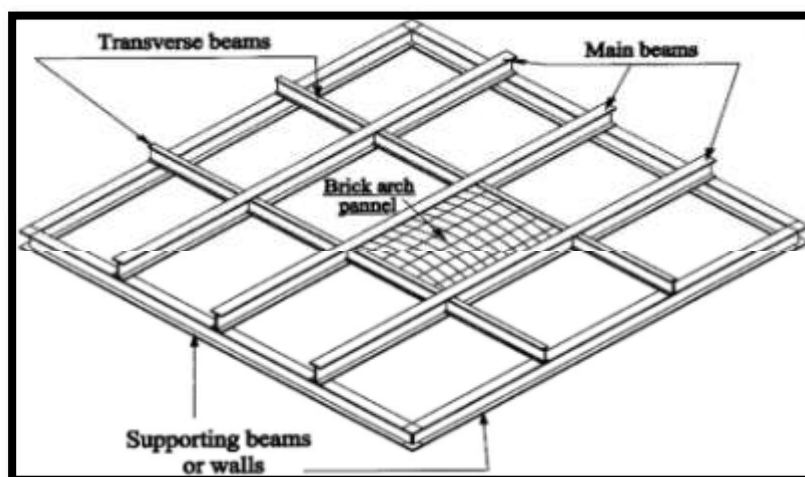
Details of a of the proposed two-way arch slab [5].
